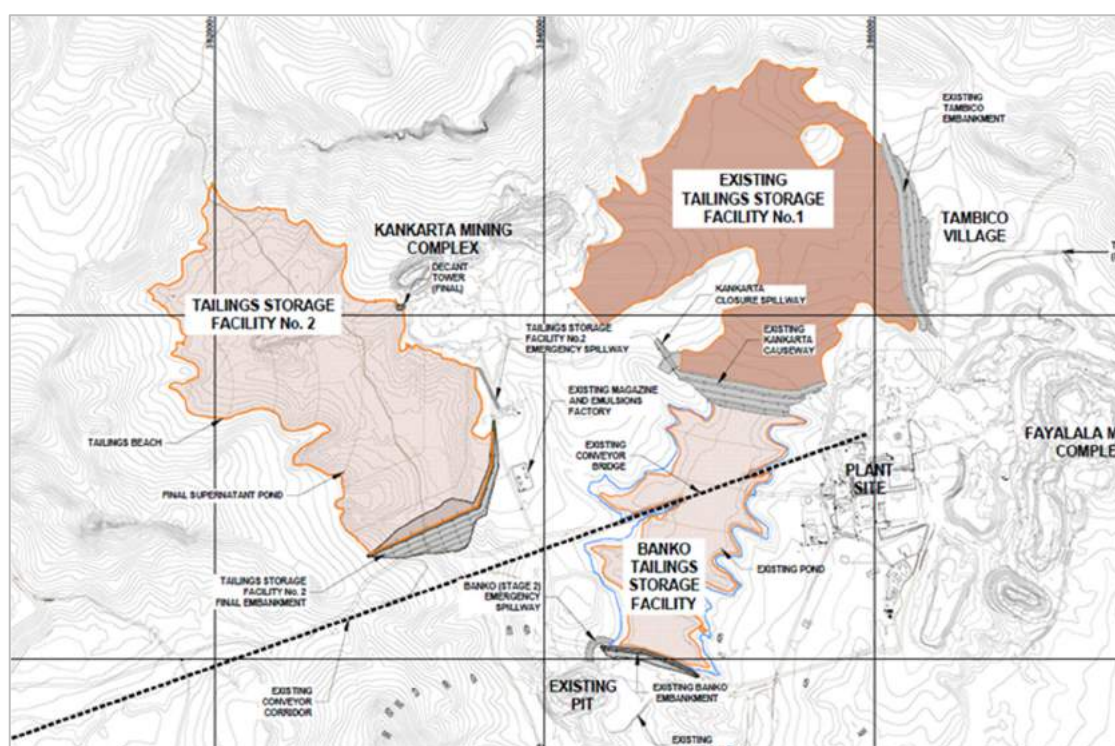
Lefa Existing and Planned Tailings Storage Facilities
